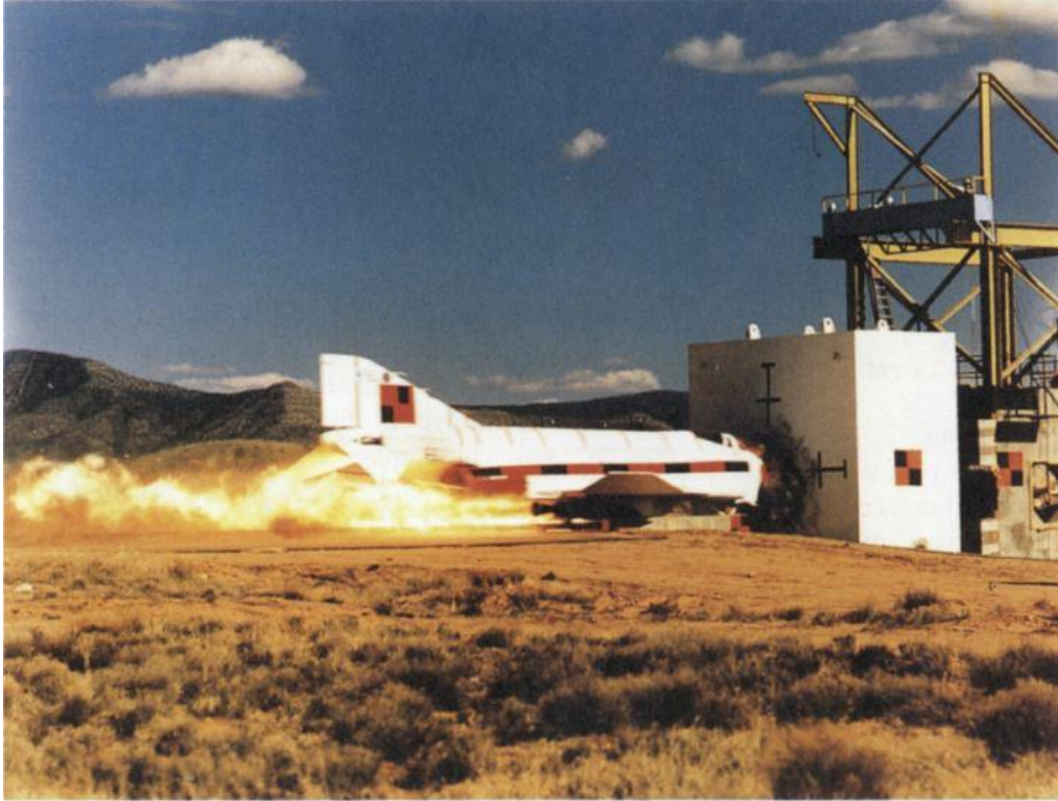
Phantom F4 striking reinforced concrete wall (Sugano et al. 1993a)
